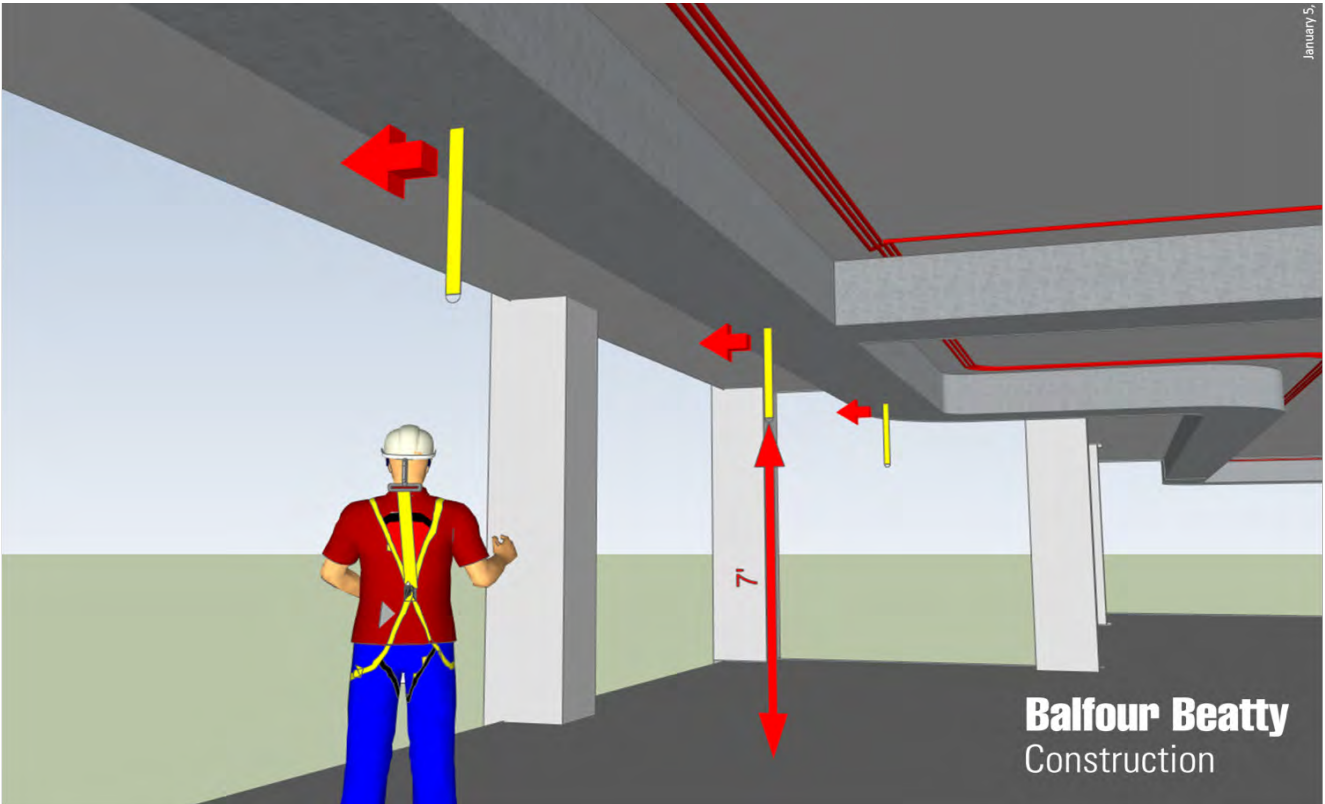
Embedded fall protection anchor traps clash elimination with HVAC systems using BIM (Picture Courtesy Balfour Beatty Construction)
